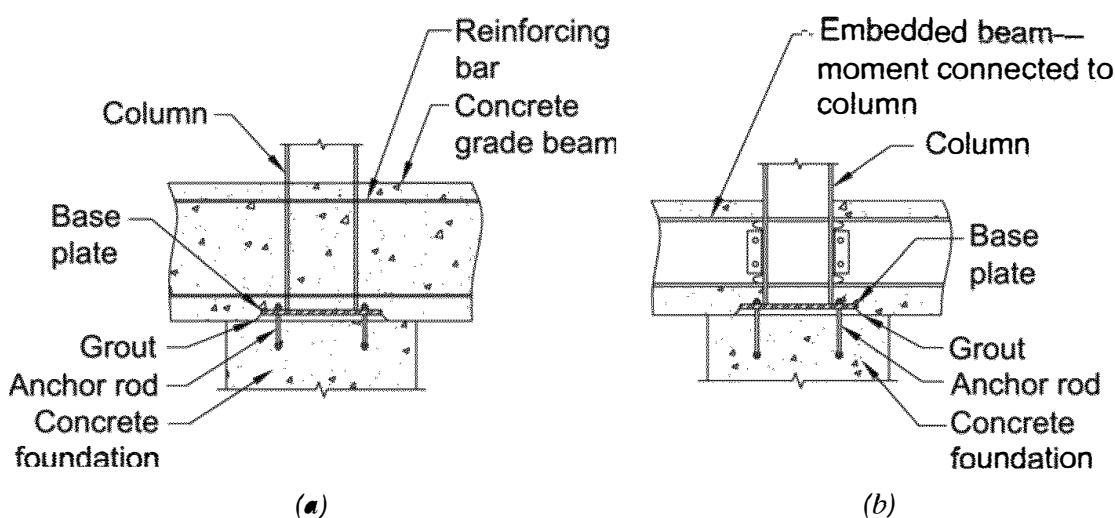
Examples of column base fixity in a grade beam.
